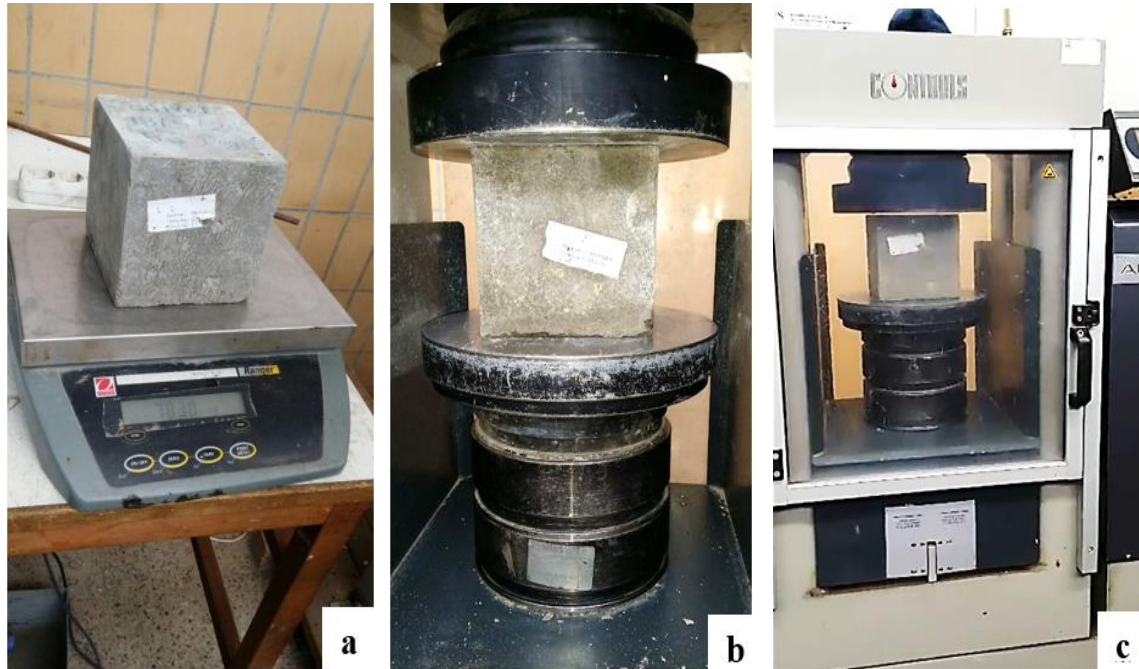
Cubic compressive test setup a) Weighting specimen b) test setup c) Machine under run
